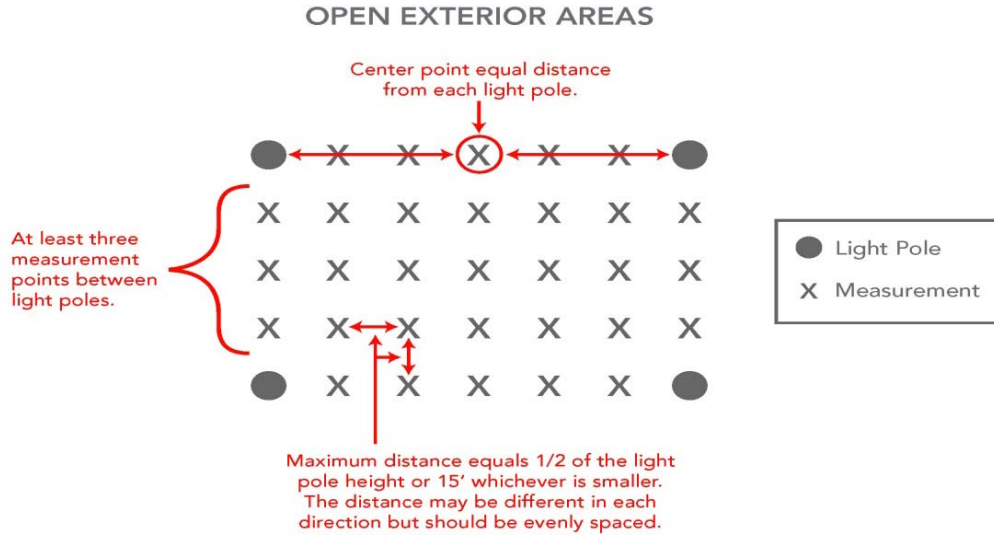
Open Exterior Areas such as Parking Lots or Storage Yards
